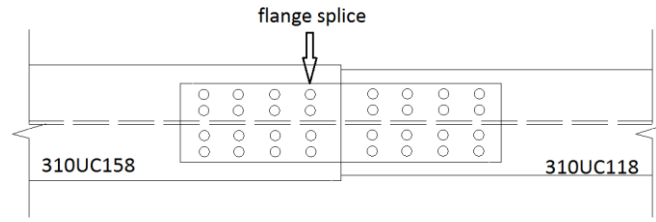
Schematic view of Specimen #7 tested about minor axis, (6mm fillers, 12mm flange plates)
